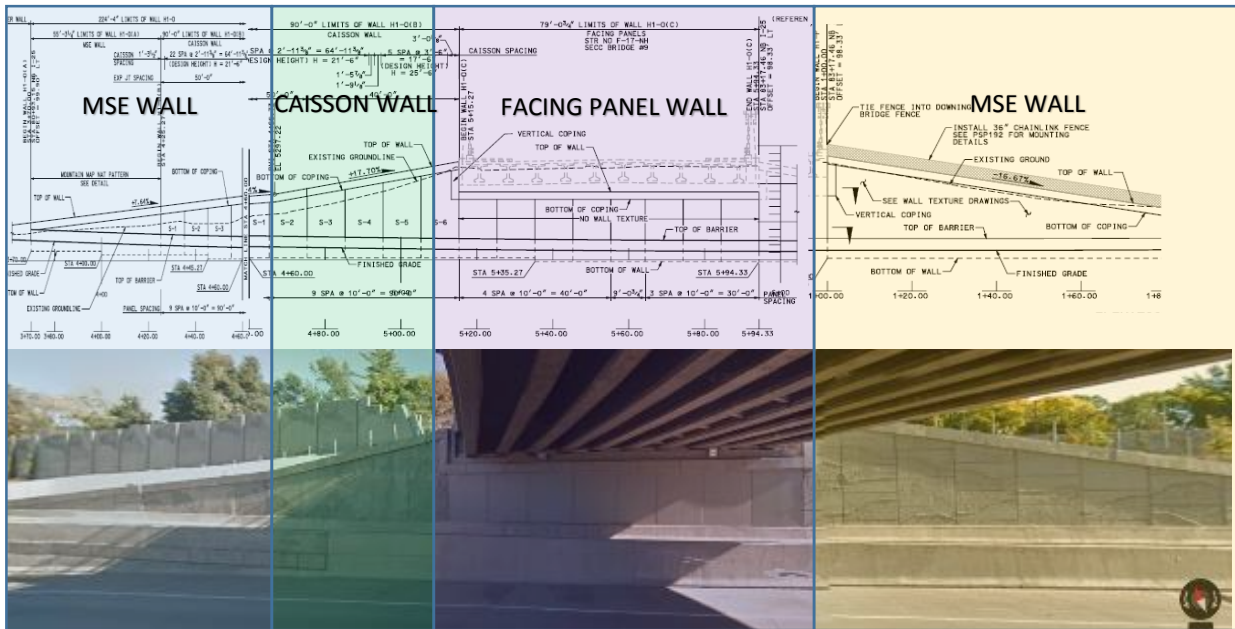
FIGURE D: EFFECTIVE BRIDGE ZONE BETWEEN TWO BRIDGES
